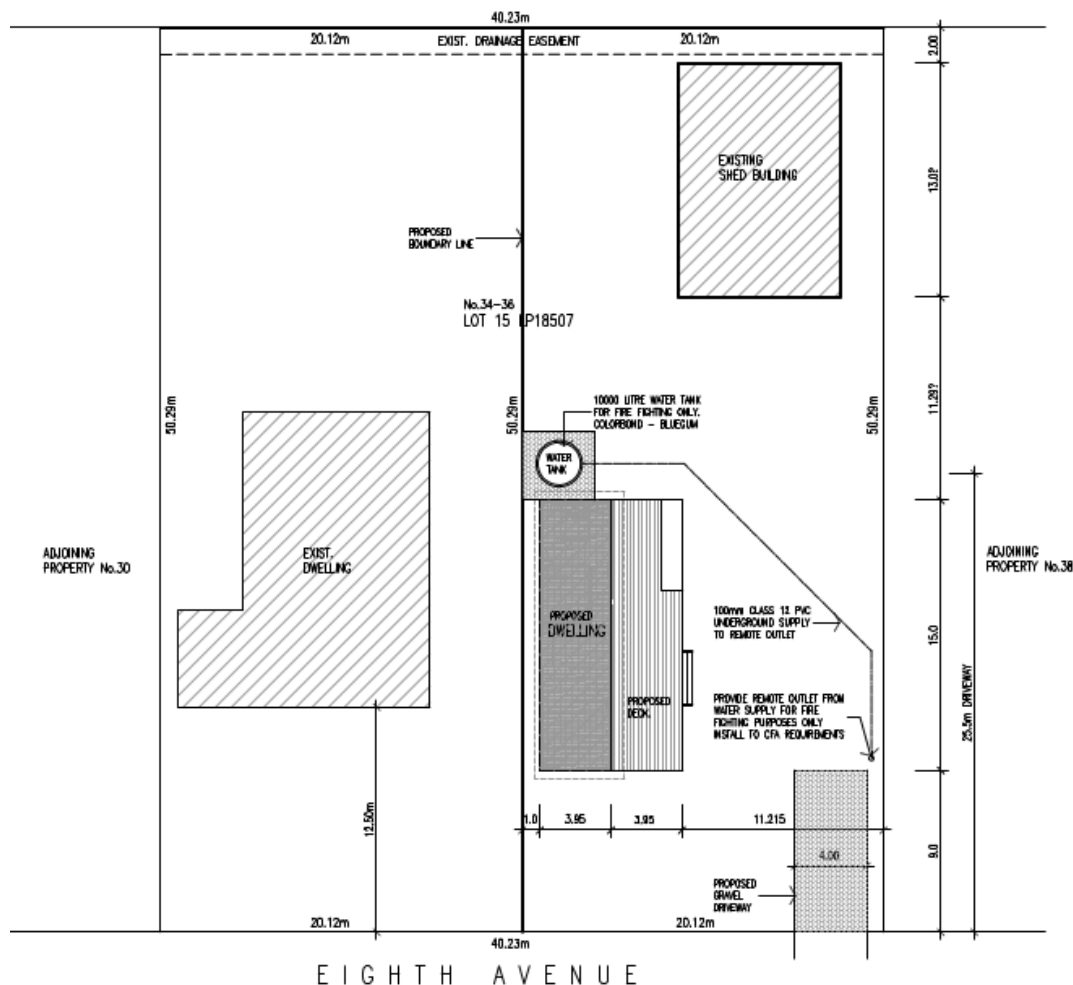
site plan for proposed second dwelling at 34-36 Eighth Ave
